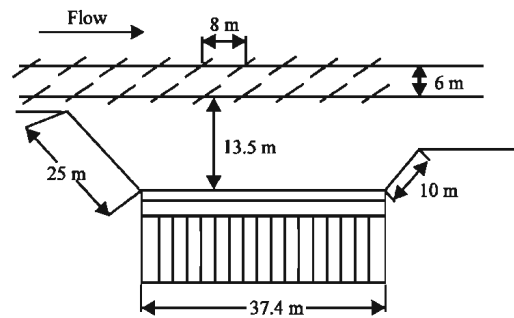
The two rows layout of vanes (test 8) (external layout)
